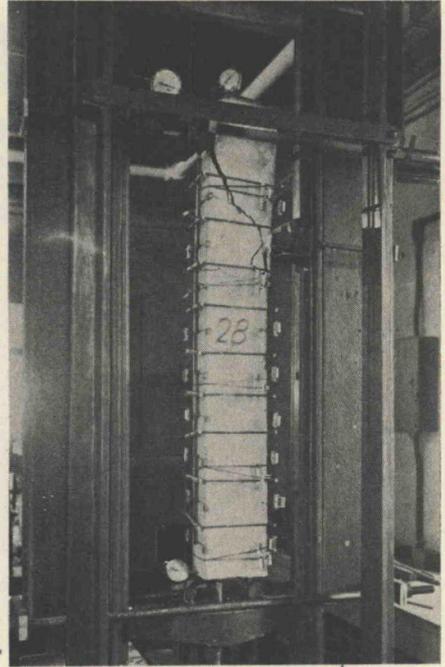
Beam No. 28 After Test. A primary Tension Failure Followed by a Secondary Bond and/or Diagonal Tension Break. The Tension Failure Is Indicated by the Tensile Cracks and the Absence of a Bottom Split from Sudden Recoil.
